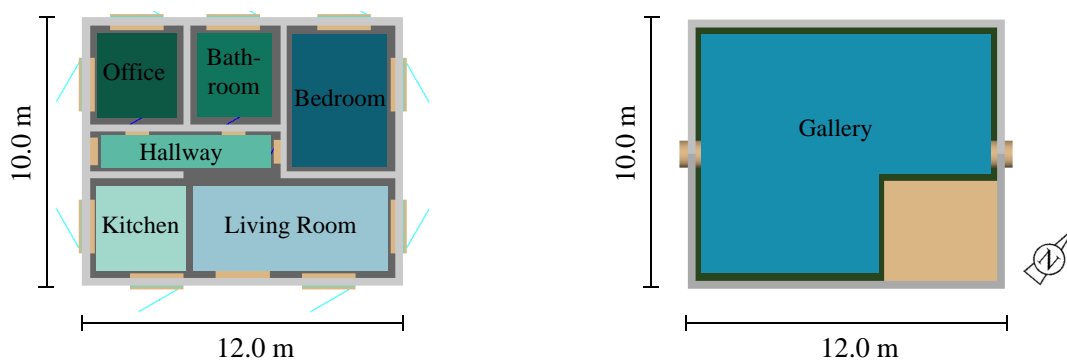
First floor of the FZK-House. IFC spaces are marked in the floor plan. Figure 84. Second floor of the FZK-House. IFC spaces are marked in the floor plan.
